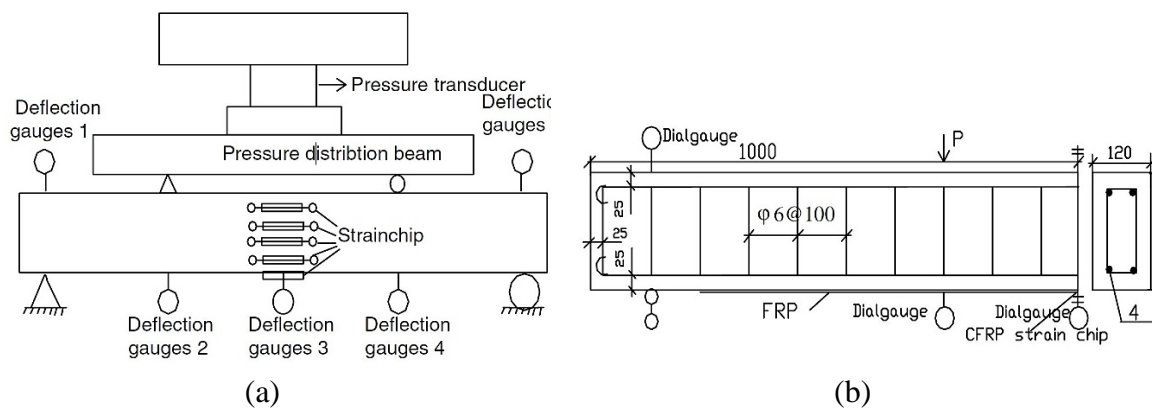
Test scheme of FRC beams: (a) measure scheme of the test; (b) configuration of FRC beams (measured in mm).
